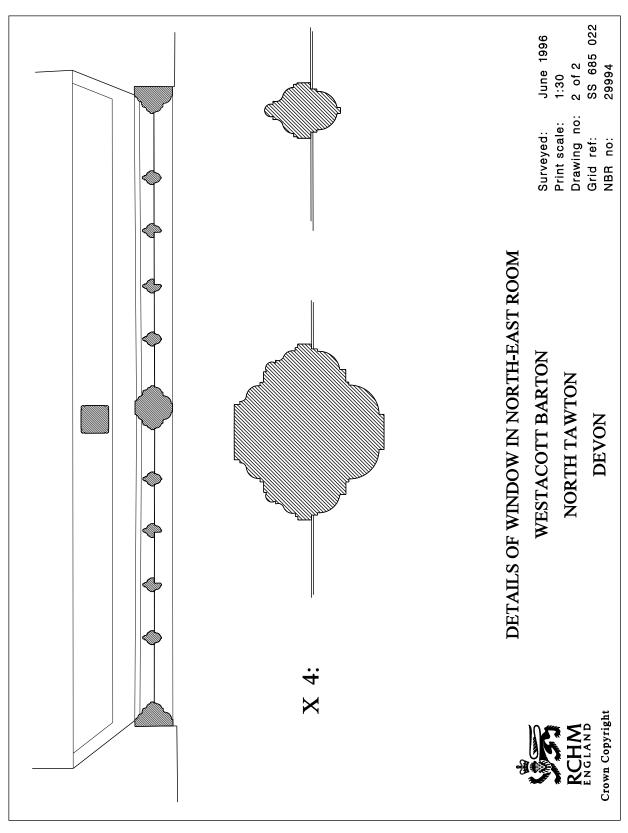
Details of window mouldings of oak-framed, ten-light window in ground-floor room of the north wing, from the 1996 RCHME report (NBR BF 29994).
